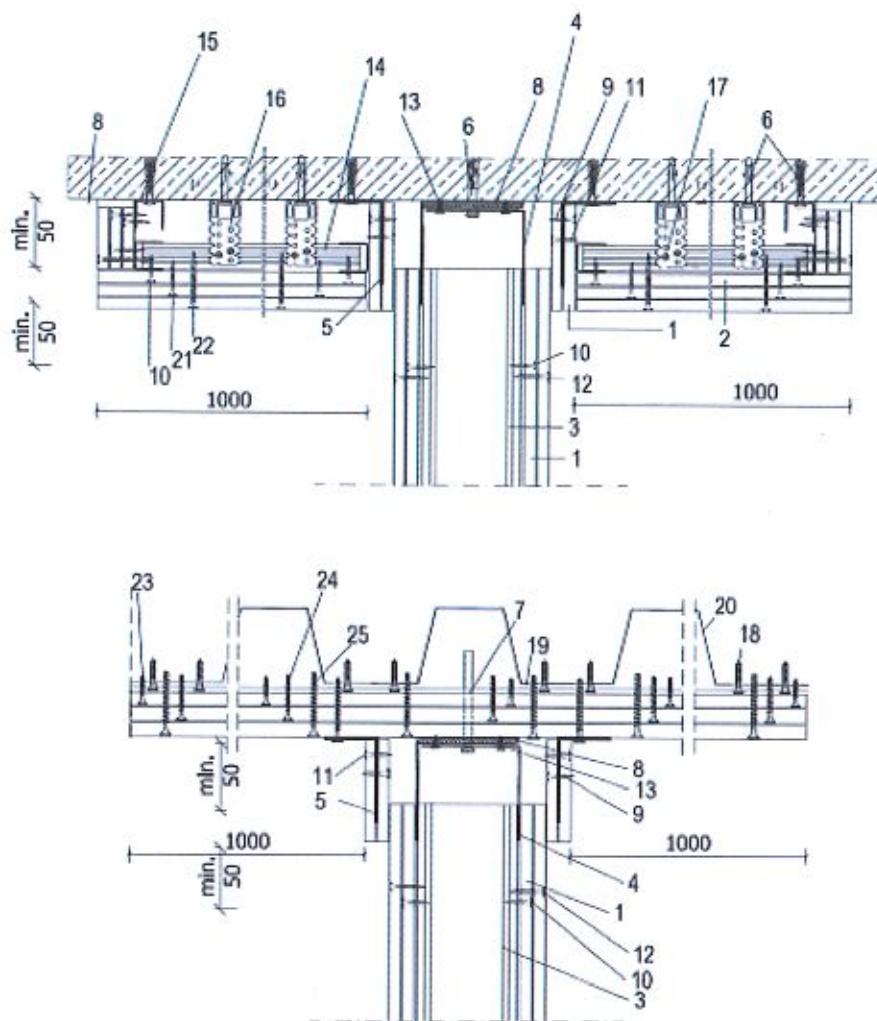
Vertical section. Telescopic connection of the wall, for the deflection of the ceiling or roof up to 50 mm and the ceiling or roof cladding not propagating fire
